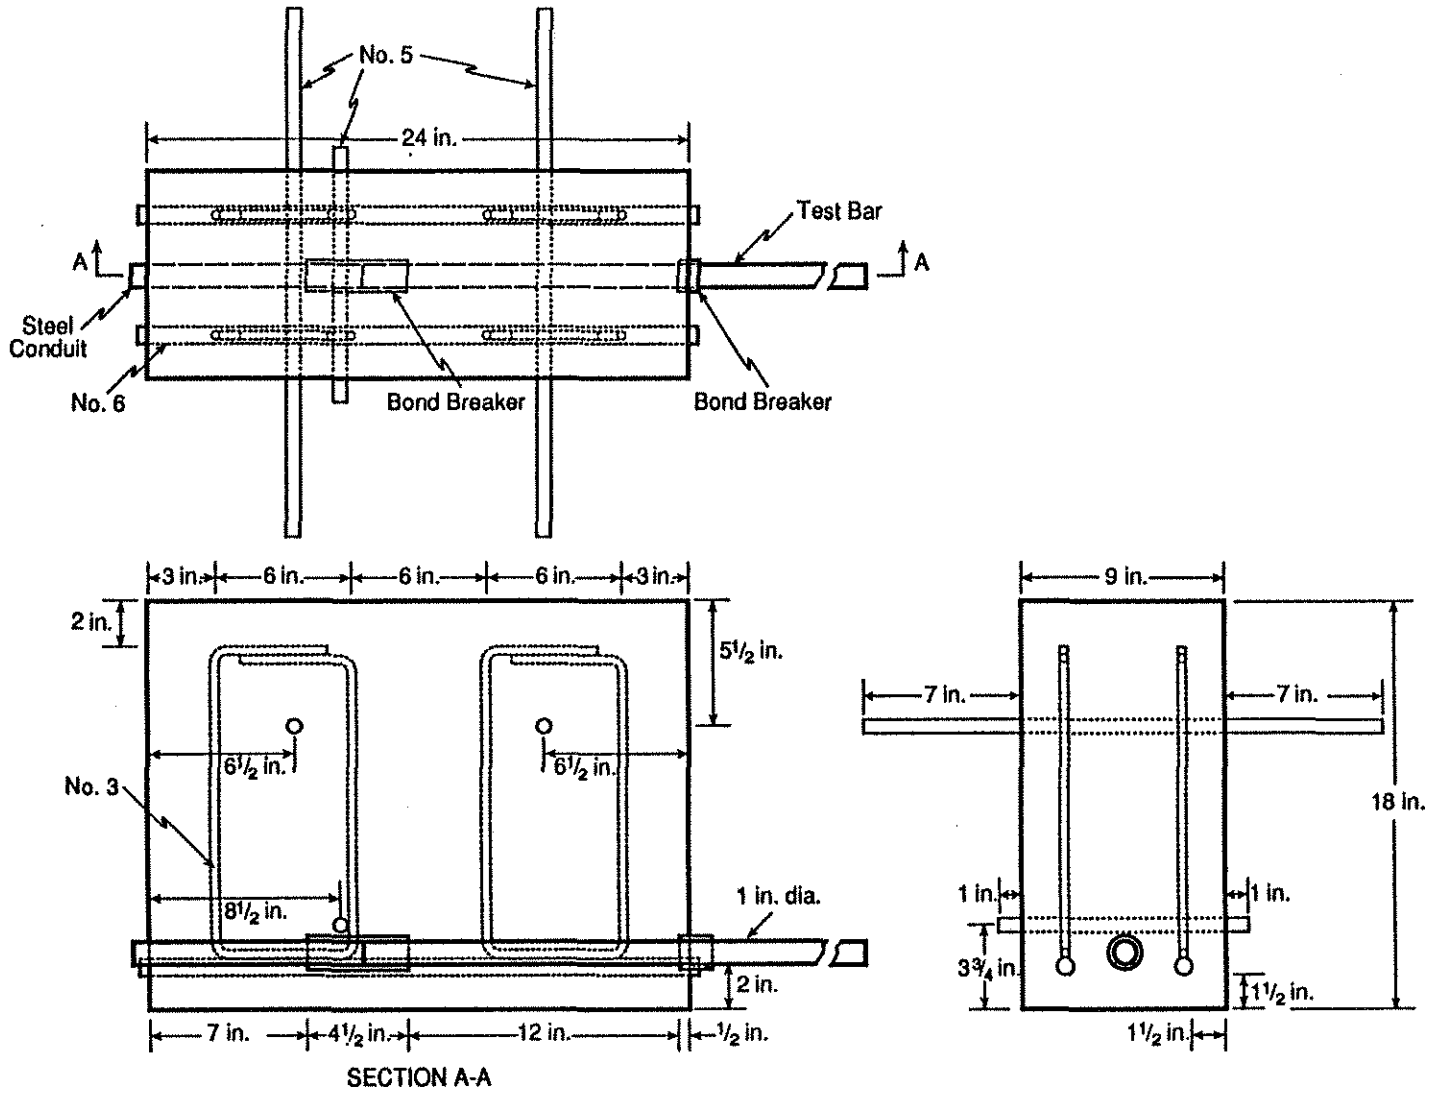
Beam-end test specimen for evaluating the bond strength of reinforcing bars not confined by transverse reinforcement
